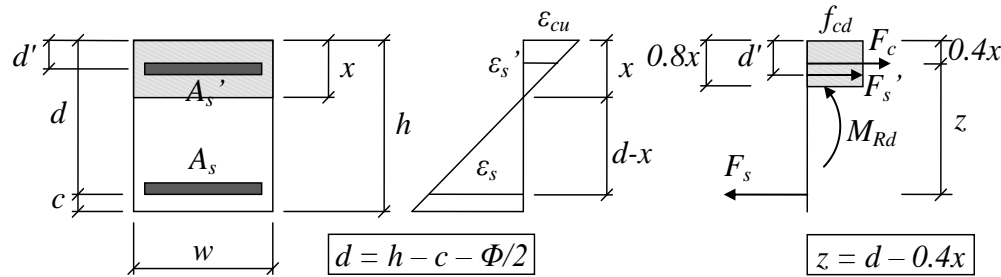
Model for moment capacity for a doubly reinforced concrete beam.
